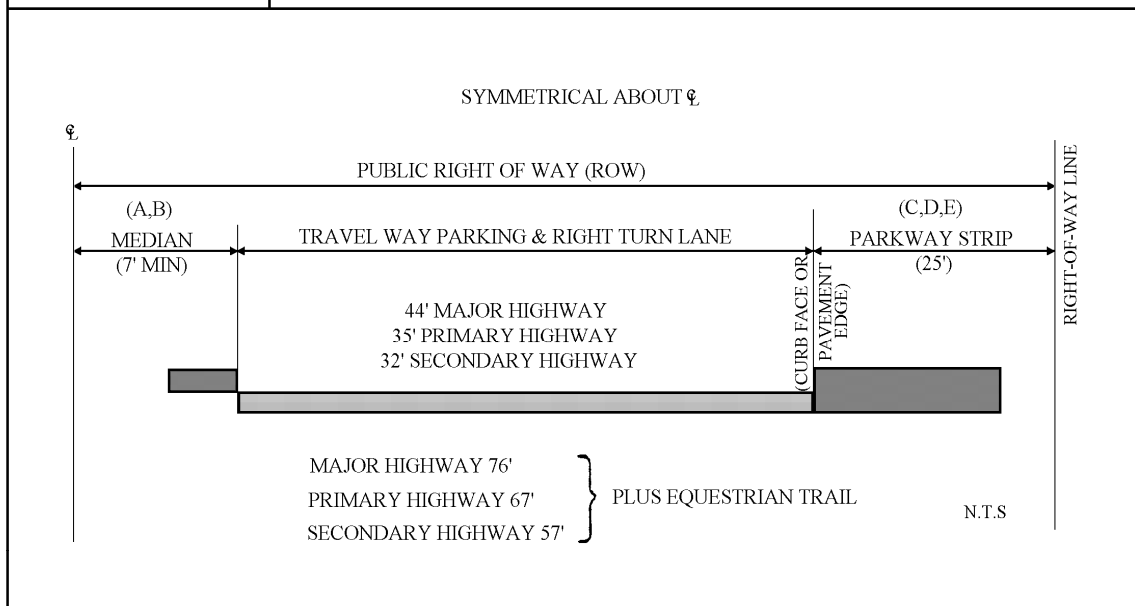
LANDSCAPE HALF-SECTION (TYPICAL)
